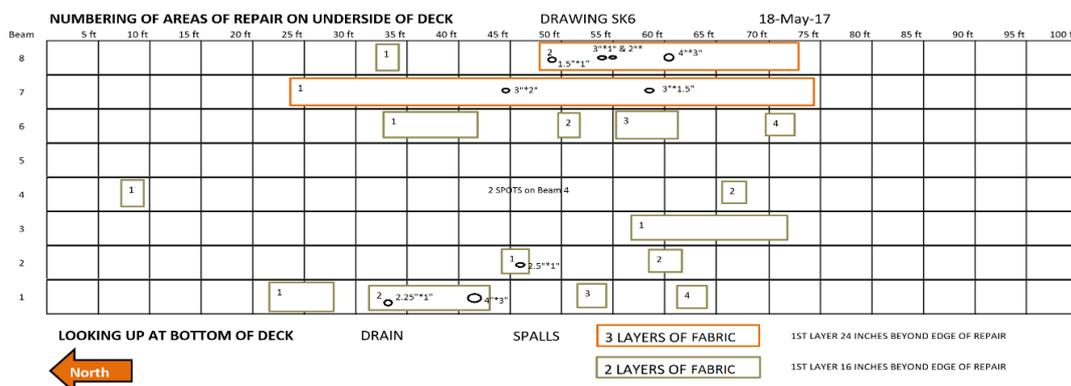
Plan of the Whiteday Creek Bridge with numbering of beams and positioning of CFRP fabric laminates with debonds
